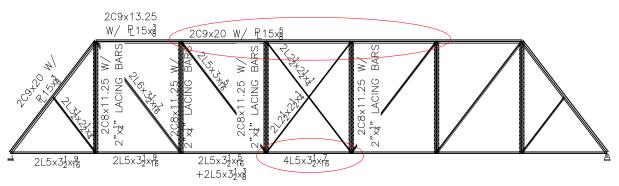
West Truss Members Requiring Strengthening for Pedestrian Live Load
